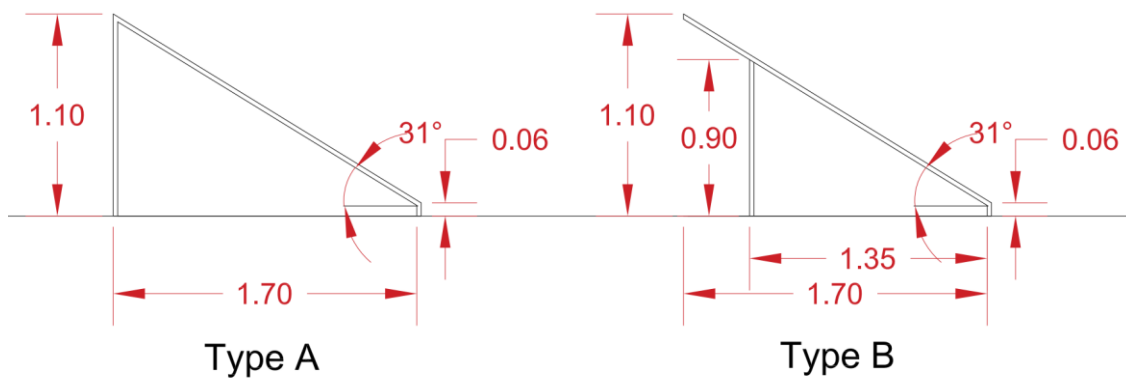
Section view of the arrangement of columns: Type A and Type B (Author)
